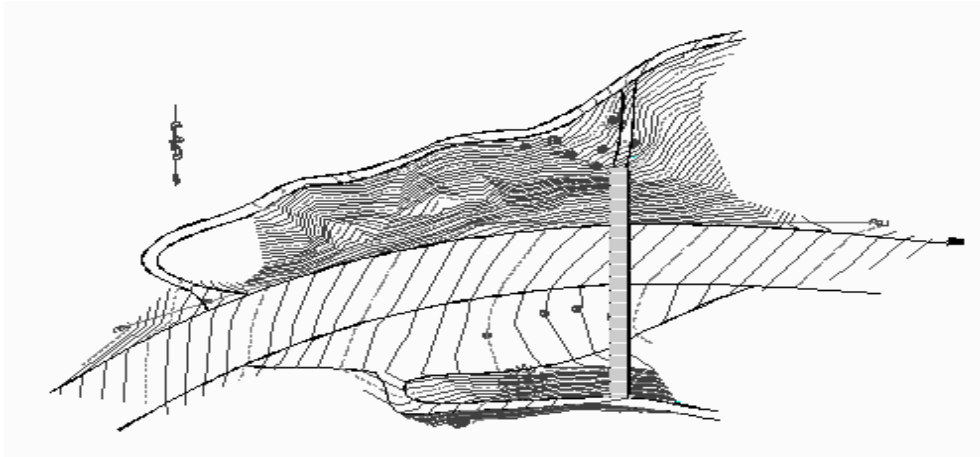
showing the topography of the Wildwood Trail and location of proposed pedestrian bridge.
